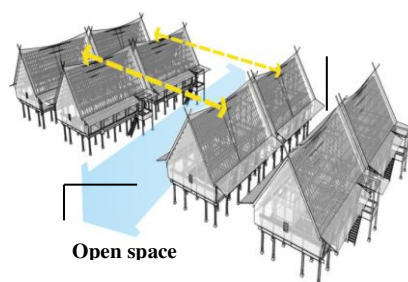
A typical Layout of Jambinese house yard with the open space for social activities (Author).
